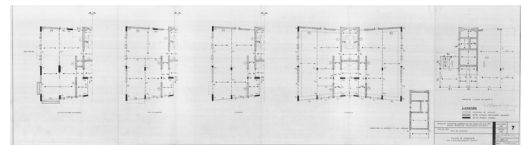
Miradouro Building: distribution plants of reinforced concrete elements (CMPorto et al., 1964).
